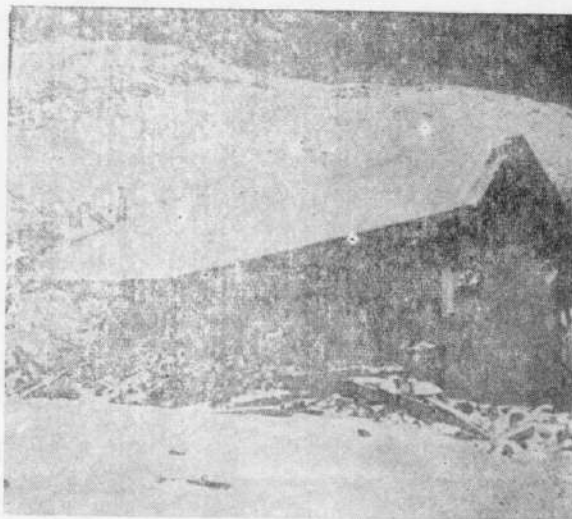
Collapsed "patwari" and "kanungo" house at Leo village.
